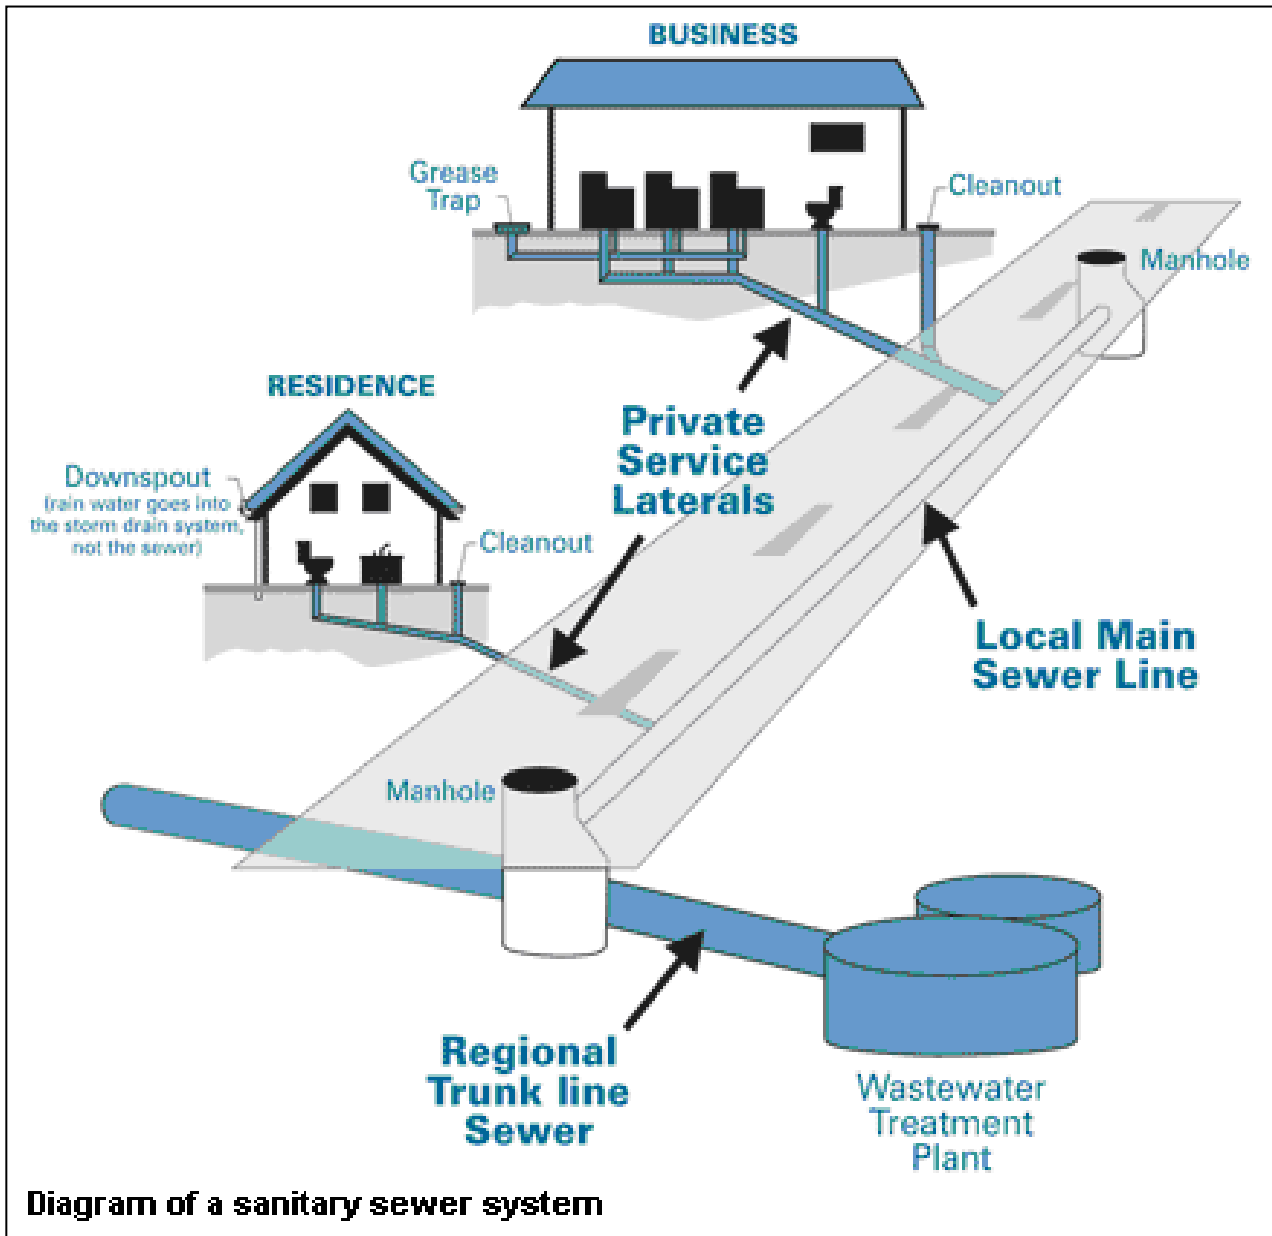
Types Of Sewers Used In Wastewater Collection System .[9]
